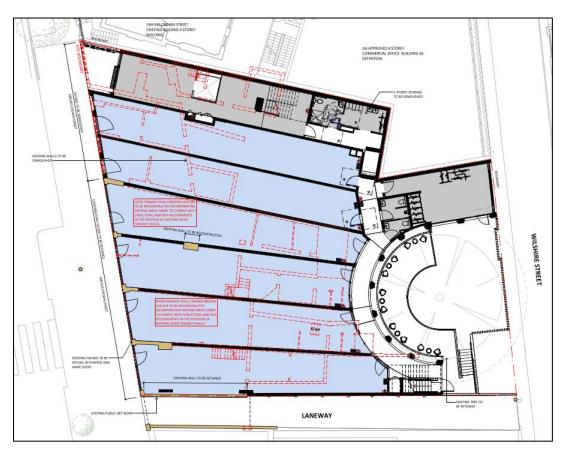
Original DA ground floor demolition plan showing new walls in black and demolished and reconstructed walls in brown
